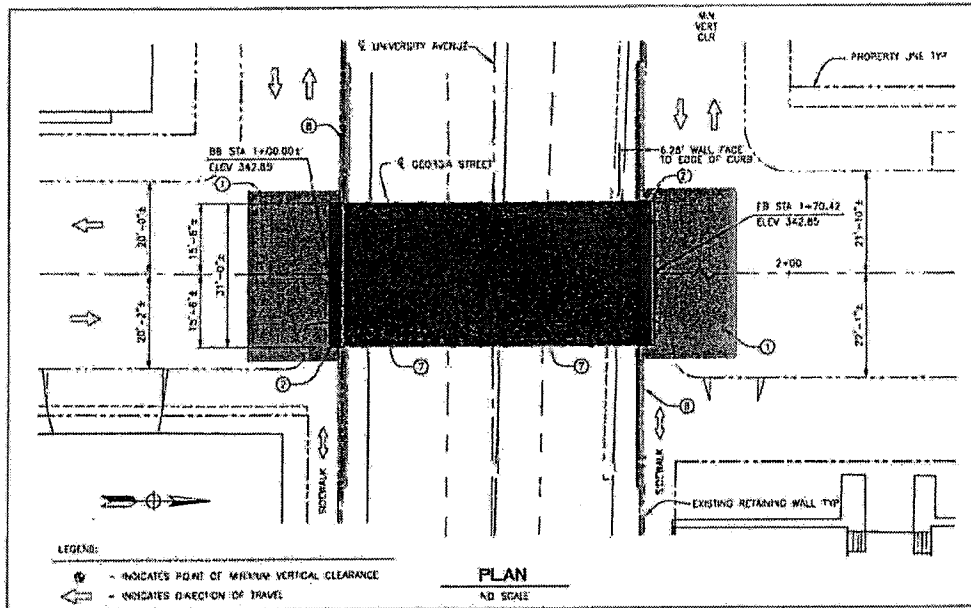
Plan diagram of preferred bridge alternative #1. Simon Wong Engineering
